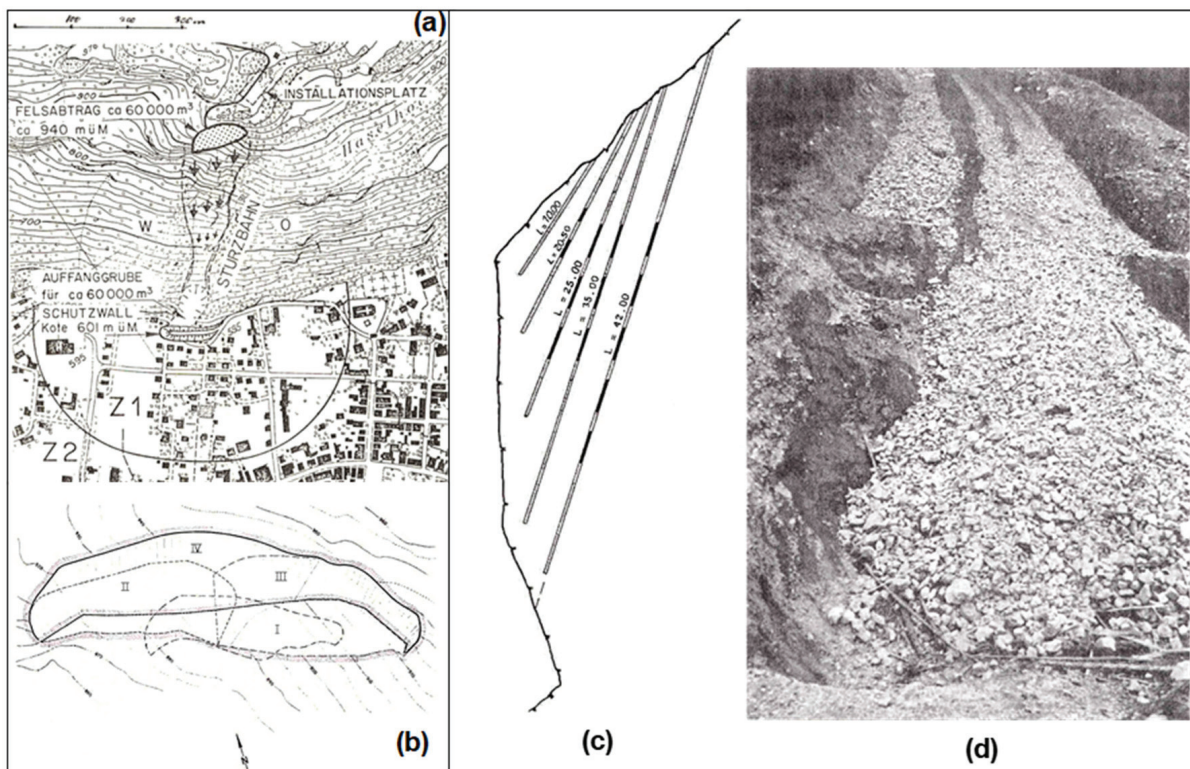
The case of Meiringen in Switzerland. (a) Plan view of the blasting project. Z1 area to be evacuated; (b) detailed plan with the subdivision of the block to be blasted in 4 rounds; (c) lateral section of the drill hole pattern from the firing plan of the second round; (d) view of the muck fan after the first round (modified after [18]).
